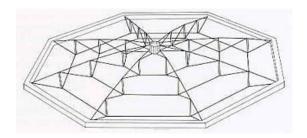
Cable Dome System by David Geiger. [Drawing: Geiger Engineers]
